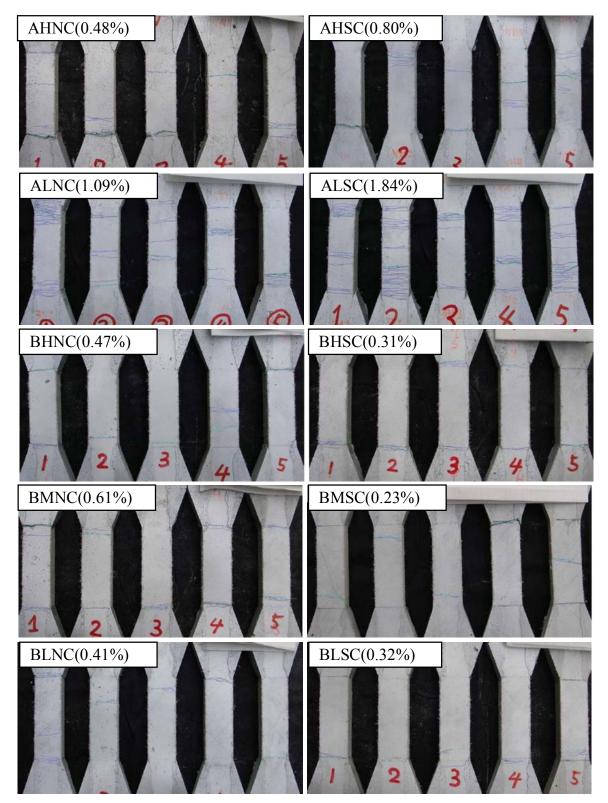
Cracking in cut-and-mold dumbbell-shaped specimens.
